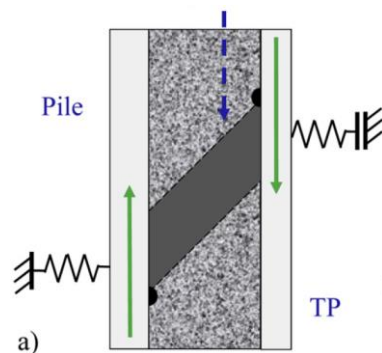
Compressive strut in grout connection (Lotsberg 2013)
